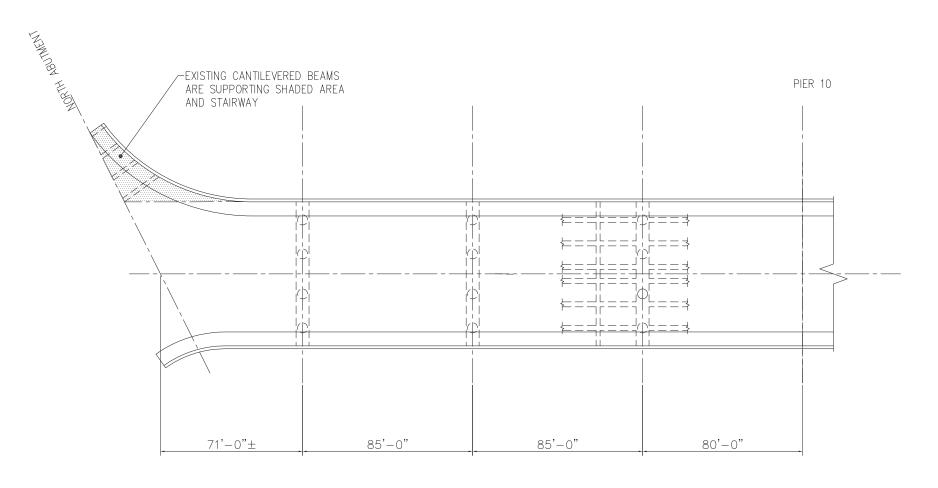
FOUR SPAN CIP CONCRETE DECK PLAN
